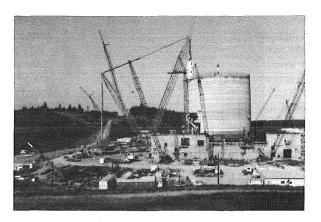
NSSS Vessel Setting Using Large Mobile Crane
